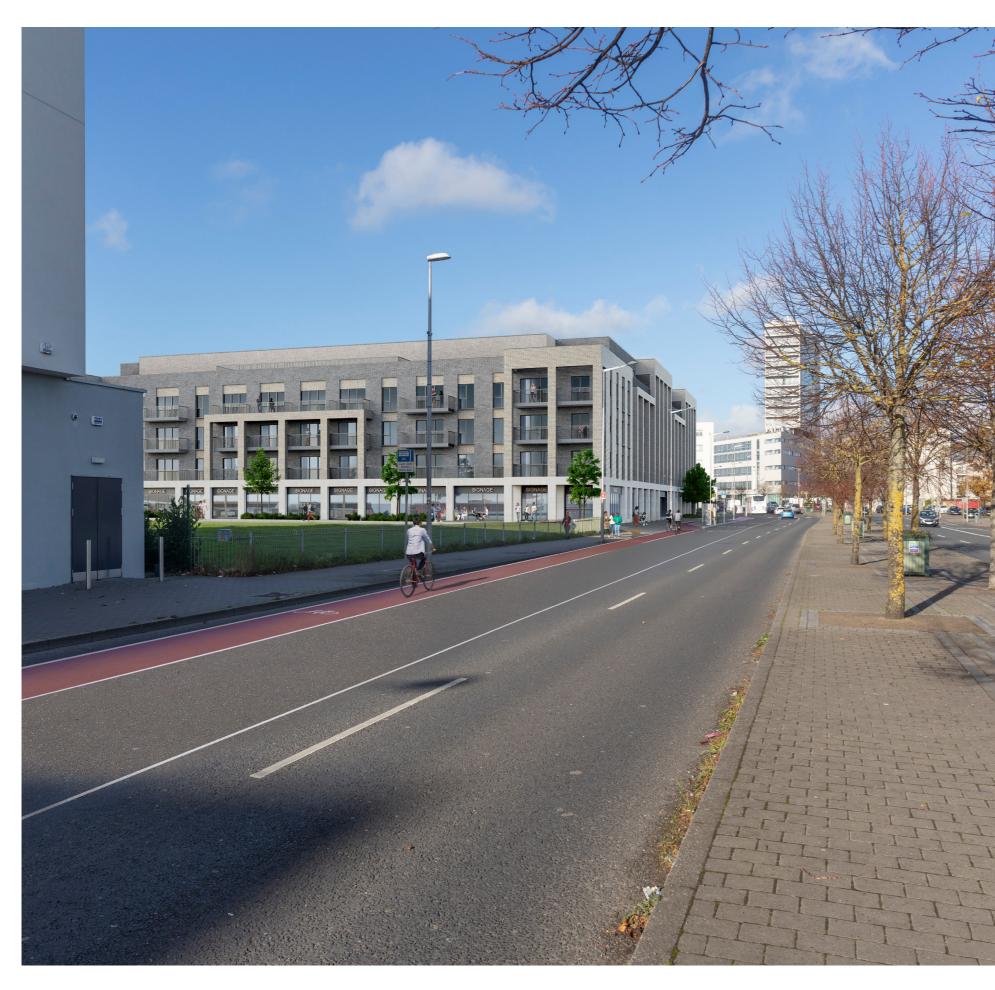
Site 5, Viewed from the south along Ballymun Road, at its corner to St. Pappin's Square
